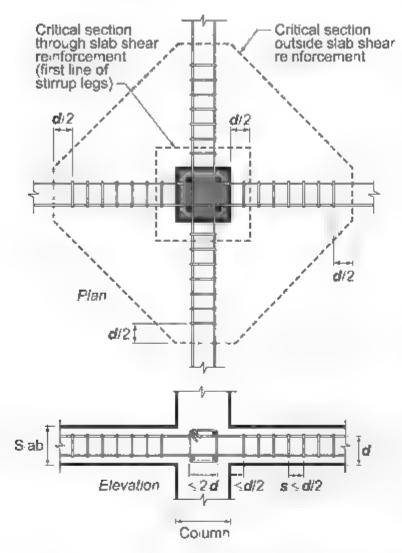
Arrangement of stirrup shear reinforcement interior column (Code Fig. R8.7 6d)
